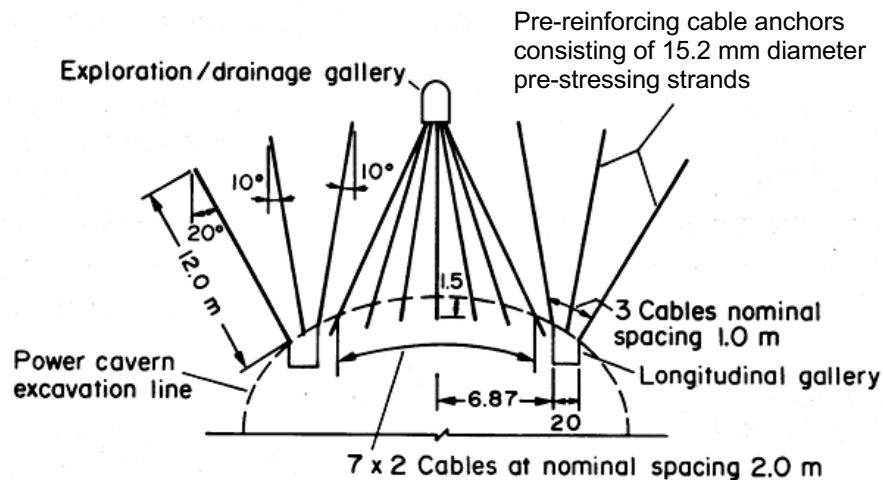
Pre-reinforcement of the power cavern roof by means of grouted untensioned cables placed from the longitudinal working galleries and from an existing exploration and drainage gallery above the roof.
